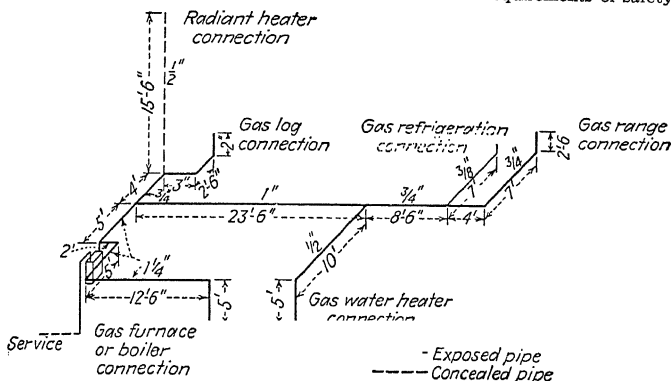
Design sketch for gas piping in a house. (From AGA "Requirements and Recommended Practice for House Piping and Appliance Installation.")
